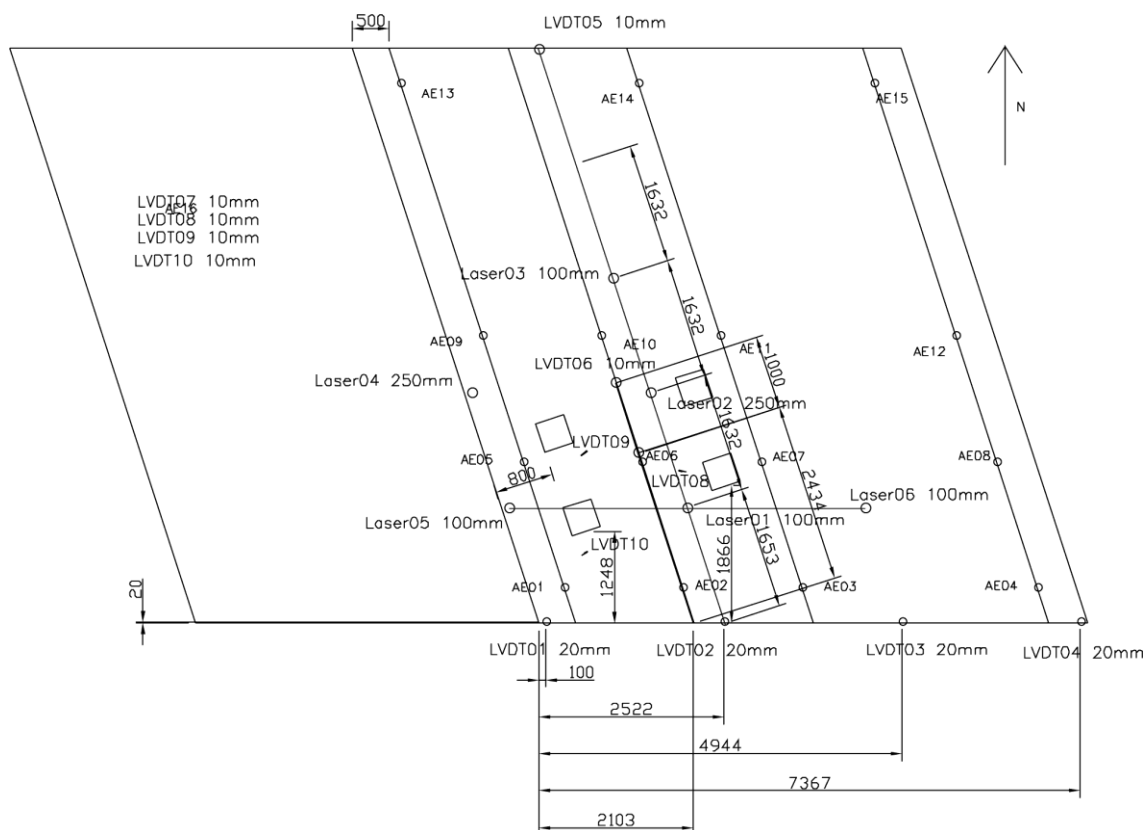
Example of sensor plan, showing position of loading tandem, position and range of lasers and LVDTs to determine deflection profiles, acoustic emissions sensors and additional LVDTs for monitoring crack width of cracks that are selected on site. Modified from (Lantsoght et al. 2017e).
